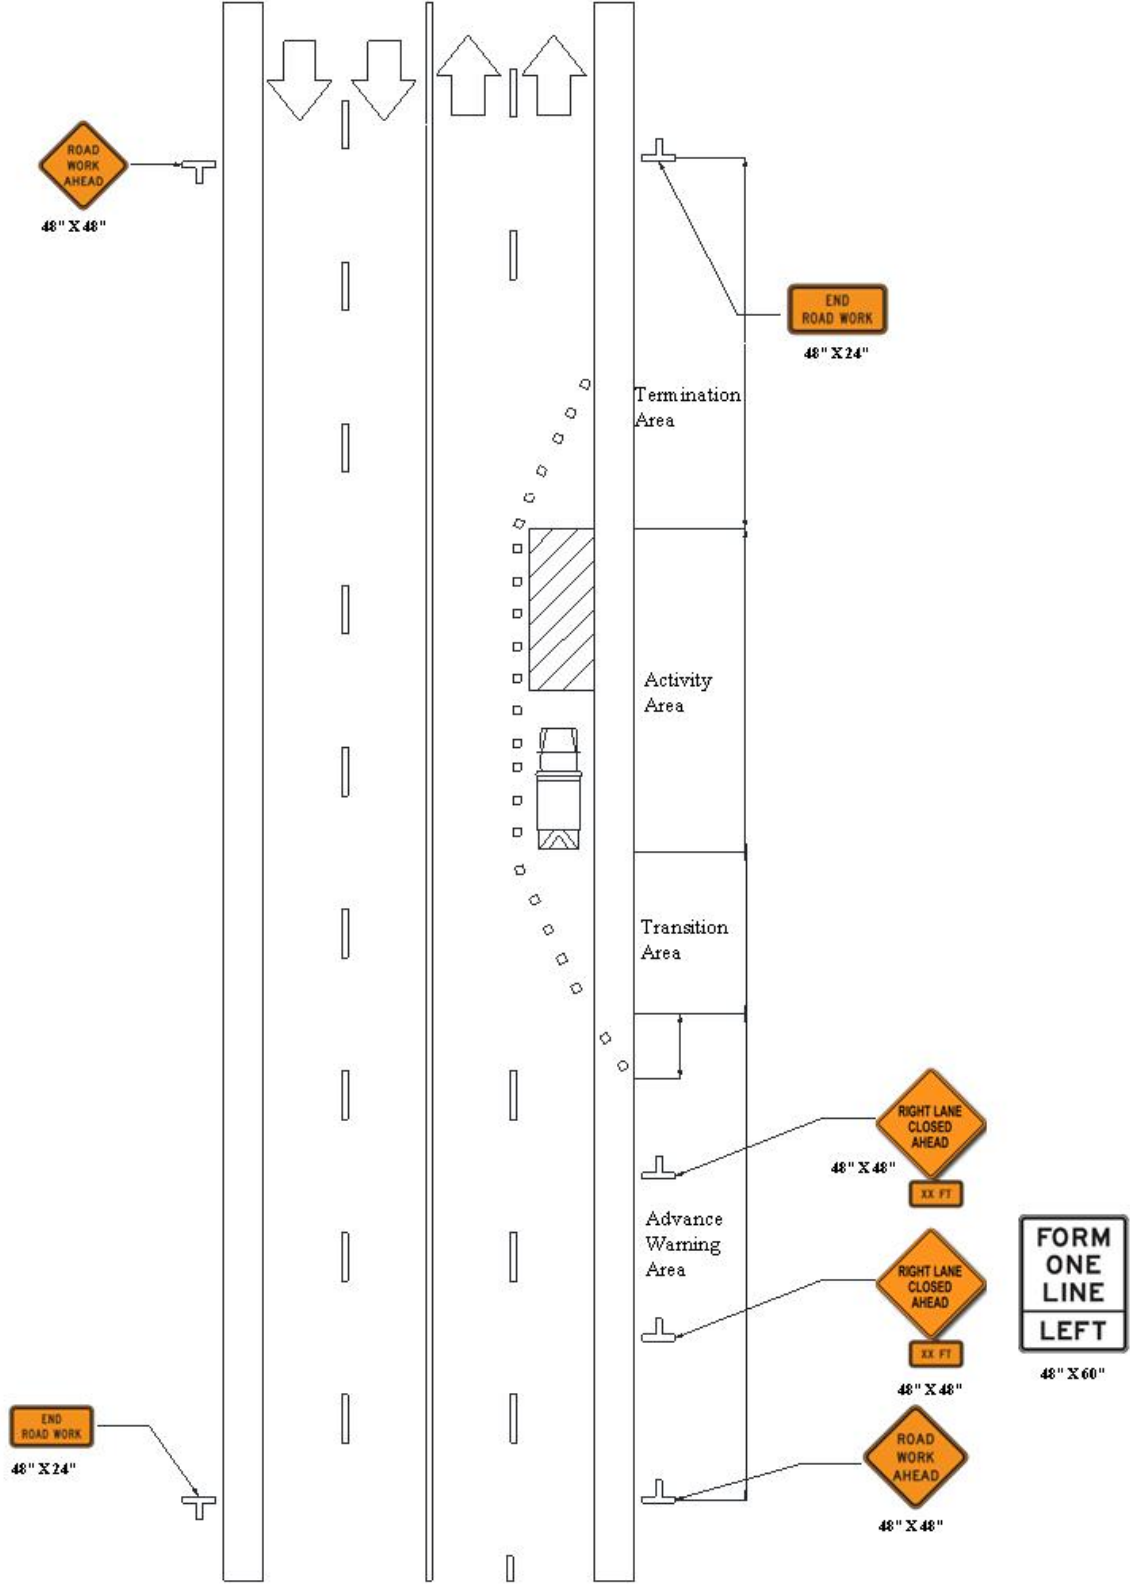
Traffic Control Plan 3 (Station 5+00 to station 9+00, station 30+00 to station 35+00)
